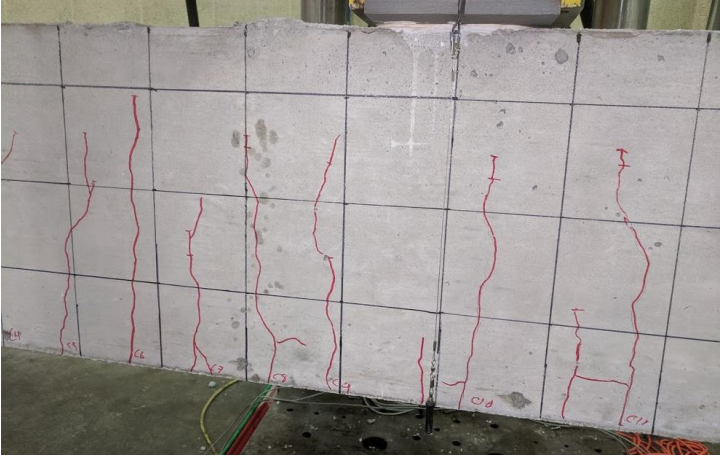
Longitudinal cracks at level of reinforcement on BM 8.5-N
